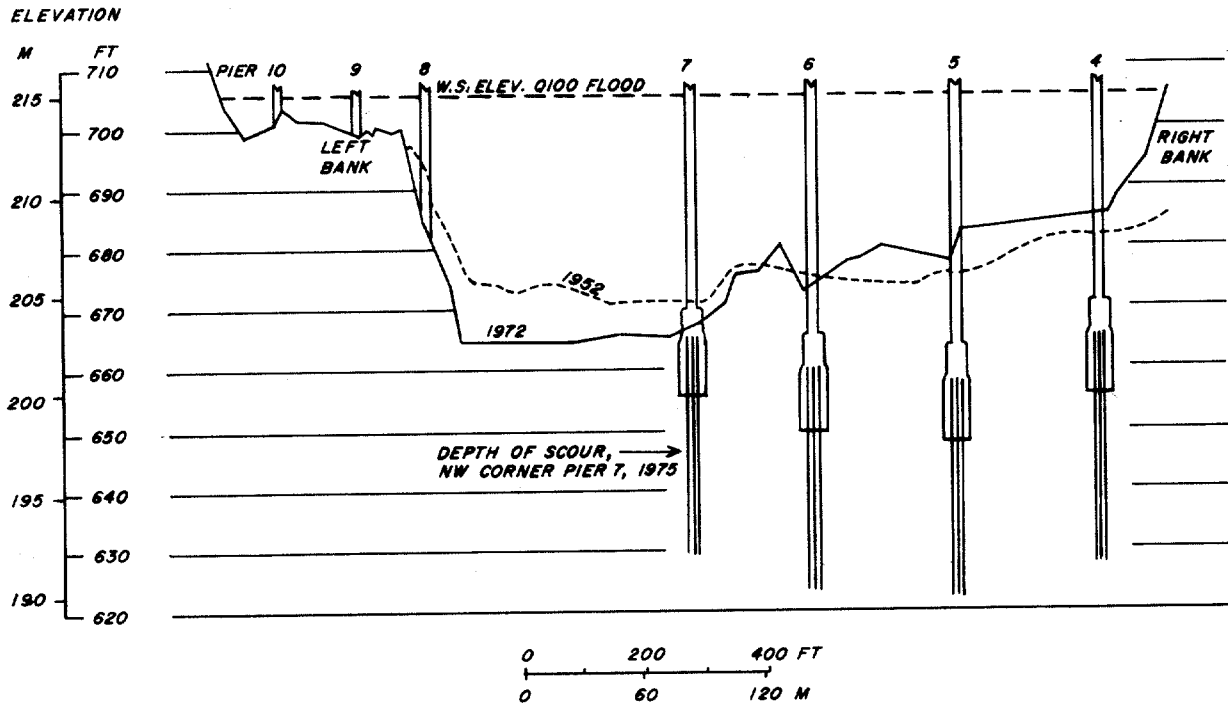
Channel cross section at I-494 bridge, showing channel degradation and depth of scour at pier 7.
